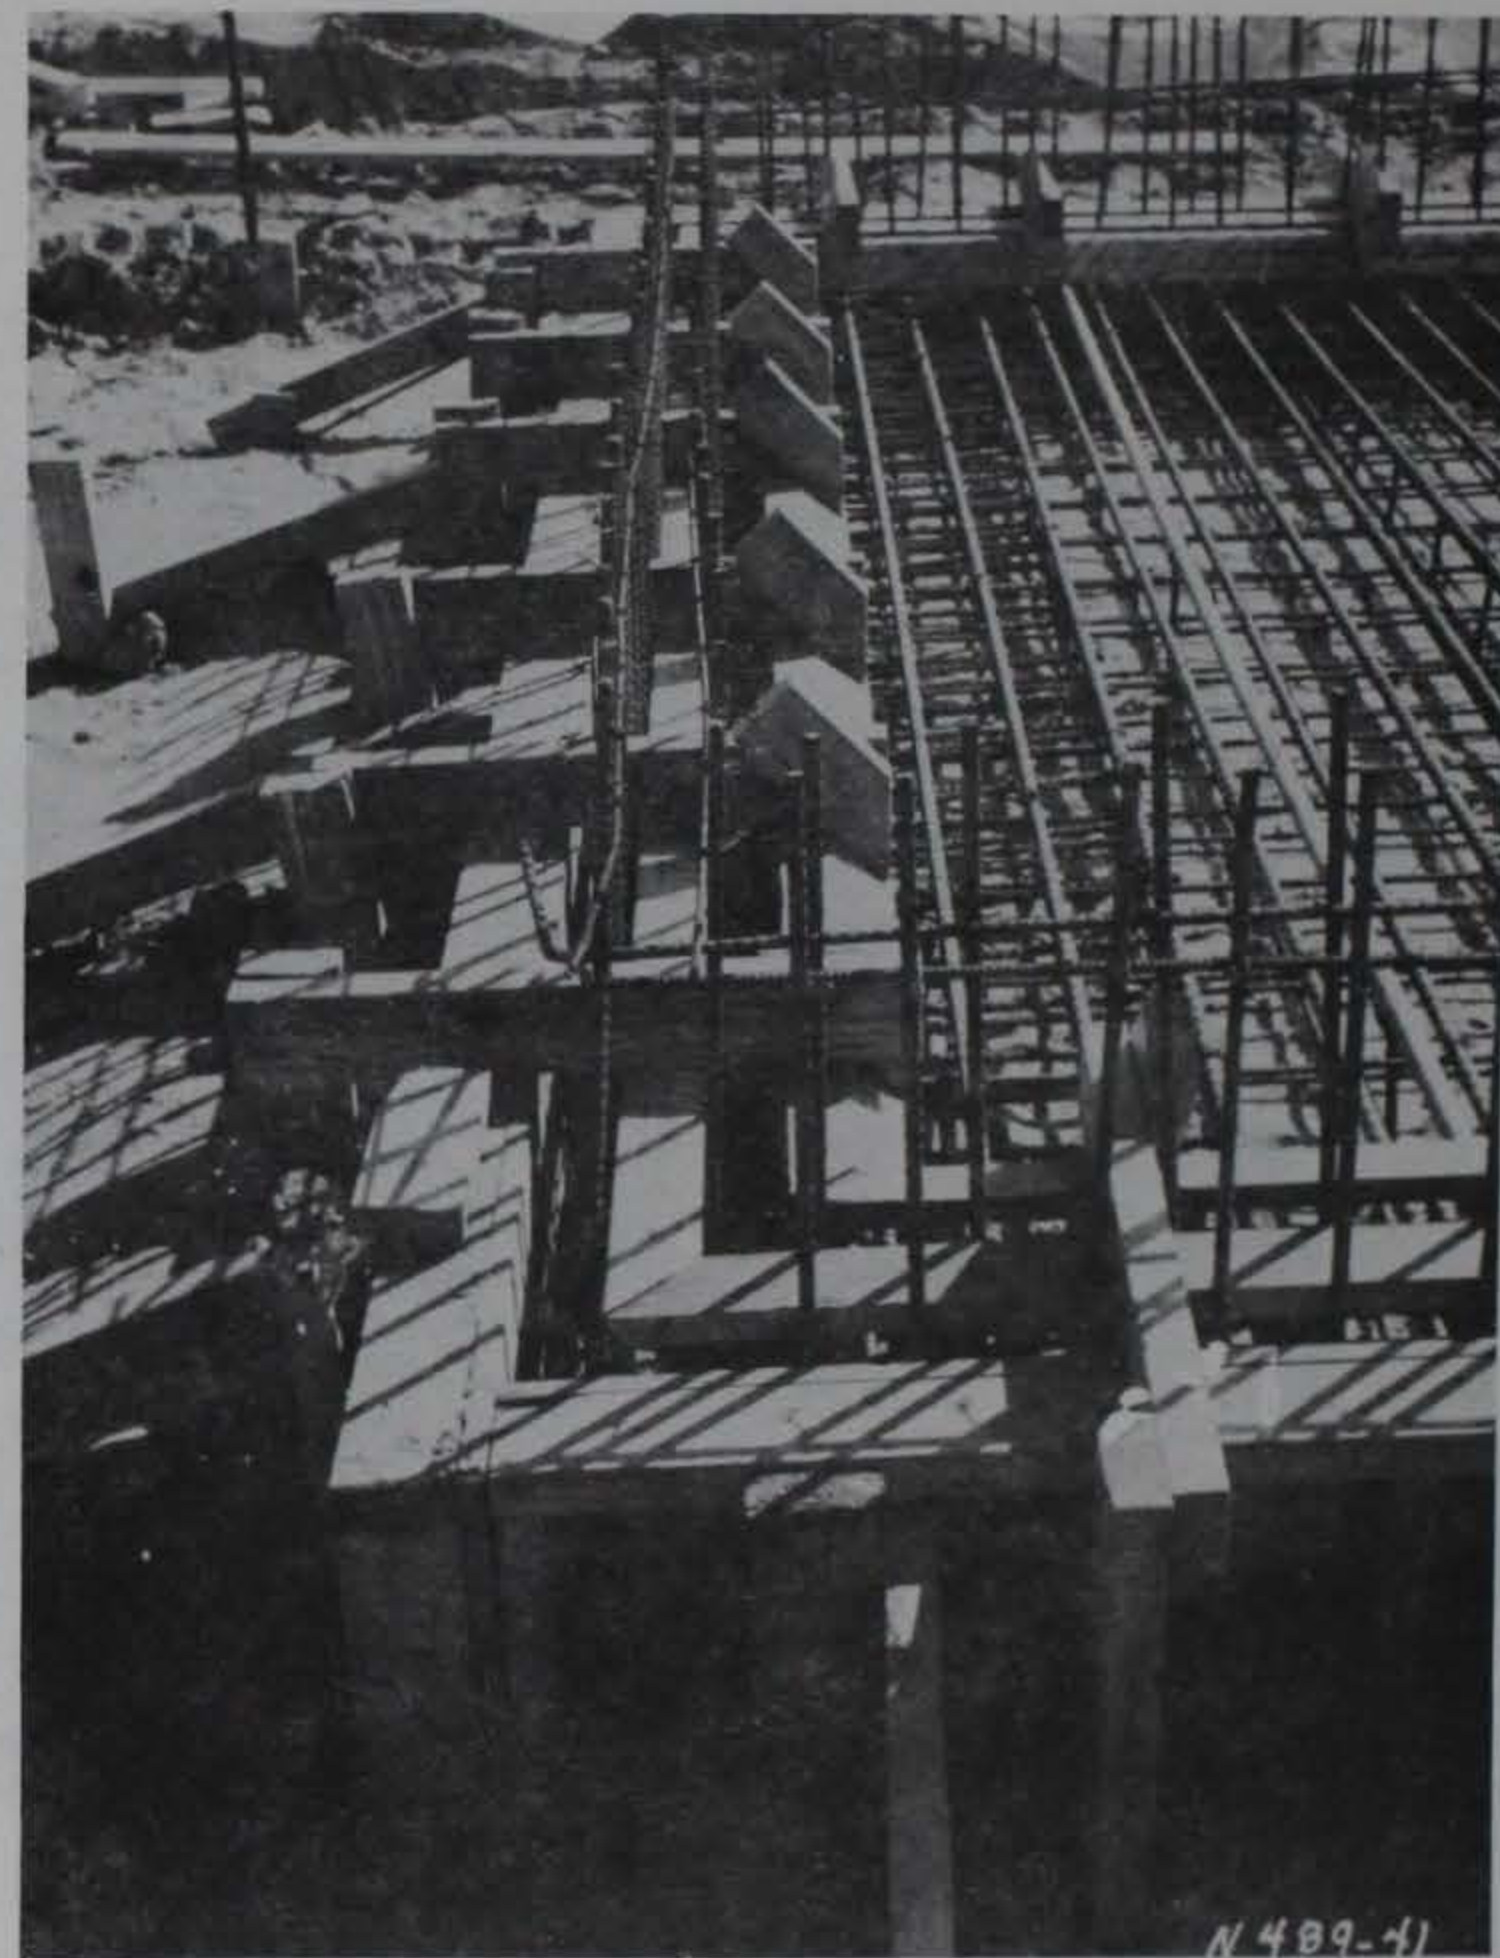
Bay floor slab formwork and reinforcing steel.
